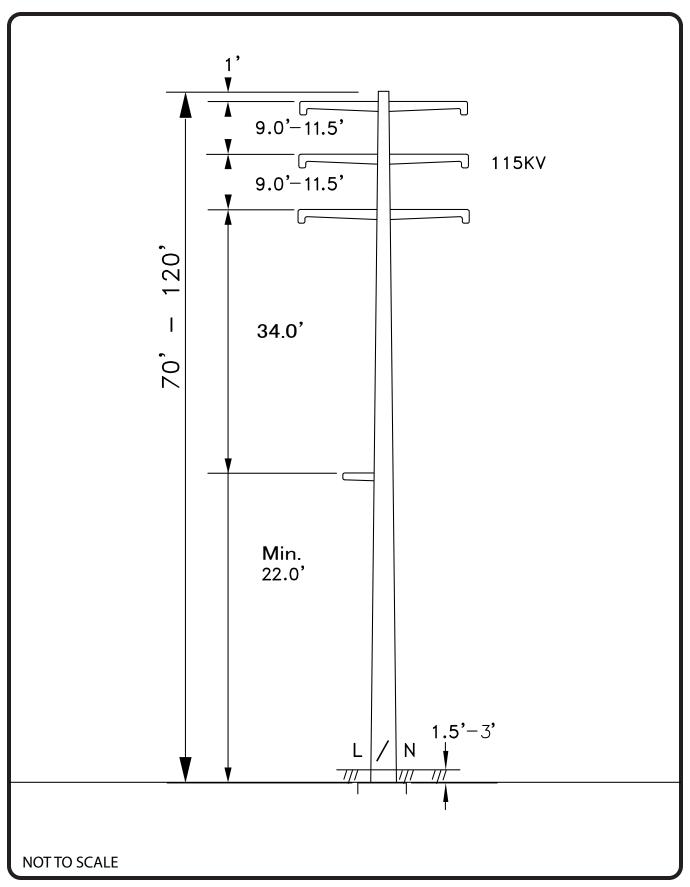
Tubular Steel Pole with Fiber Optic Cable Typical Drawing
